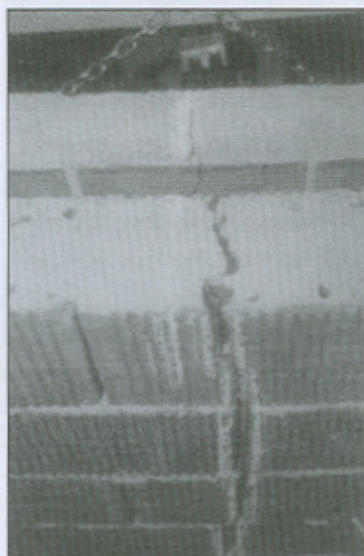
Crack produced by horizontal loading in a test wall of lightened clay block + cavity + Perforated clay brick.
